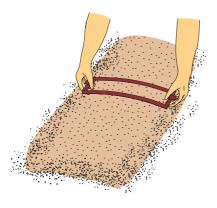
Shape the surface of sand base by using the segment mould to get proper curvature and then smooth and slightly pack the curved sand surface with a wooden trowel.
